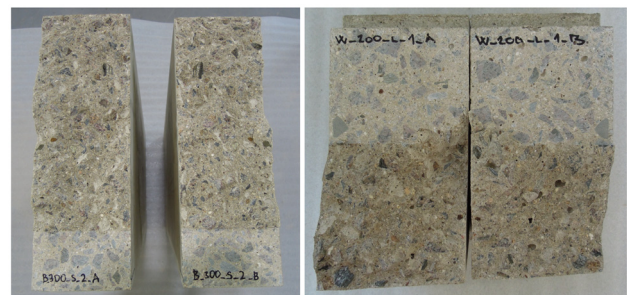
Cracked surfaces after final failure of specimens tested in three-point bending (left) and wedge splitting (right) tests.
